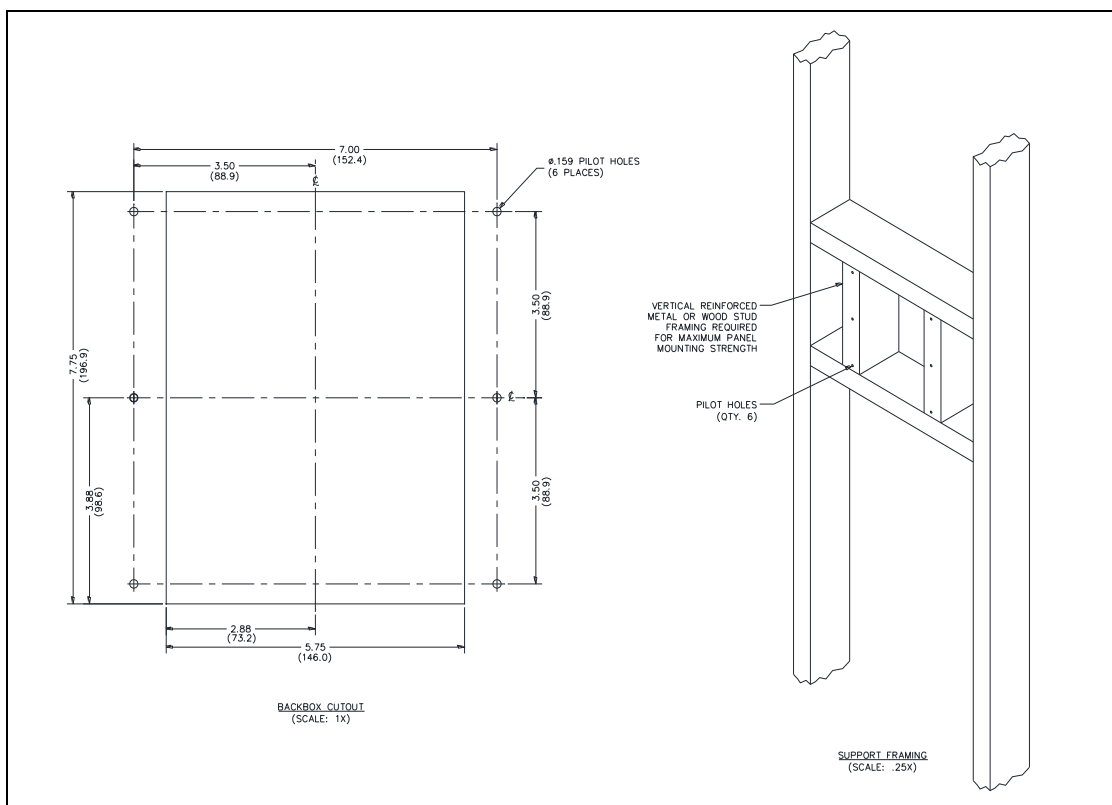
Models 277-712BH/-712BHAC Cutout and Support Framing Detail
